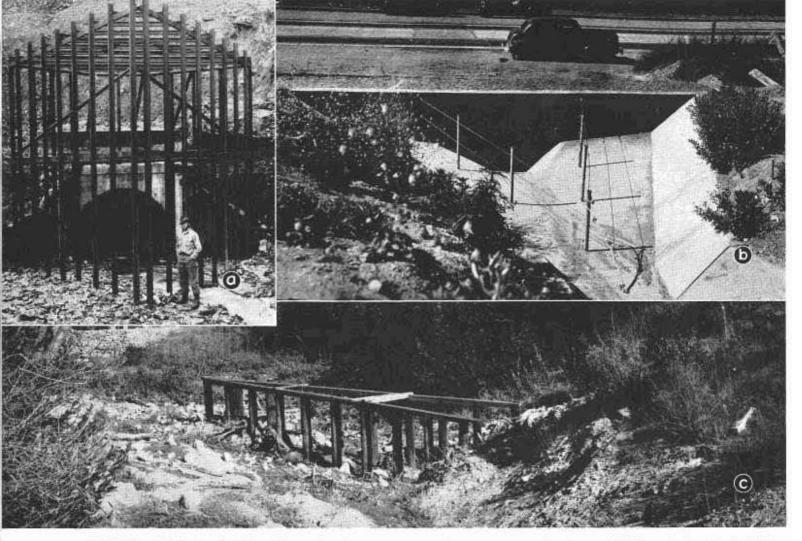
(a) Steel rail debris deflector placed at entrance to a large concrete arch culvert. (b) Wire and pipe debris deflector installed at entrance to R.C.P. culvert to deflect light floating debris. Note drop-down approach to culvert entrance. (c) Wooden pile debris deflector installed at entrance to a large culvert for the purpose of deflecting bed-load of large boulders and heavy floating debris
